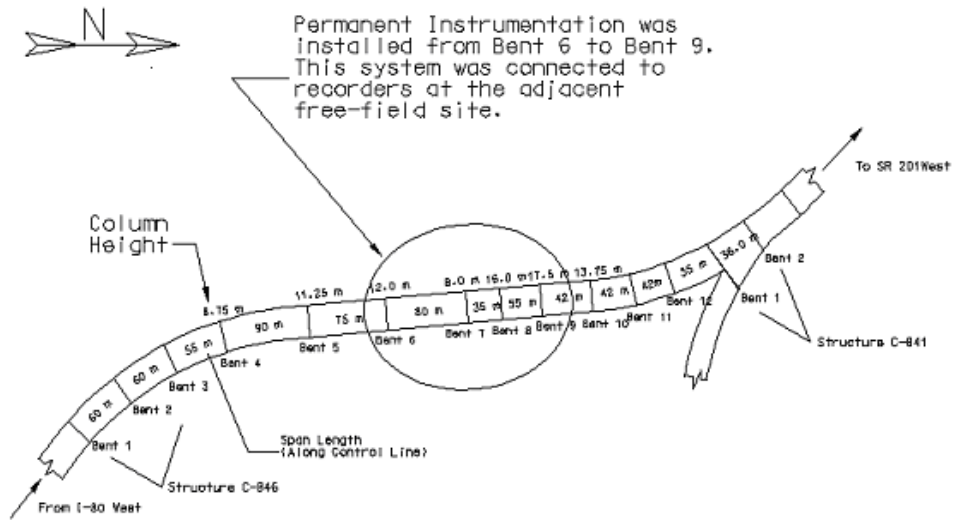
Instrumentation of Salt Lake Bridge (Halling, 2006)
